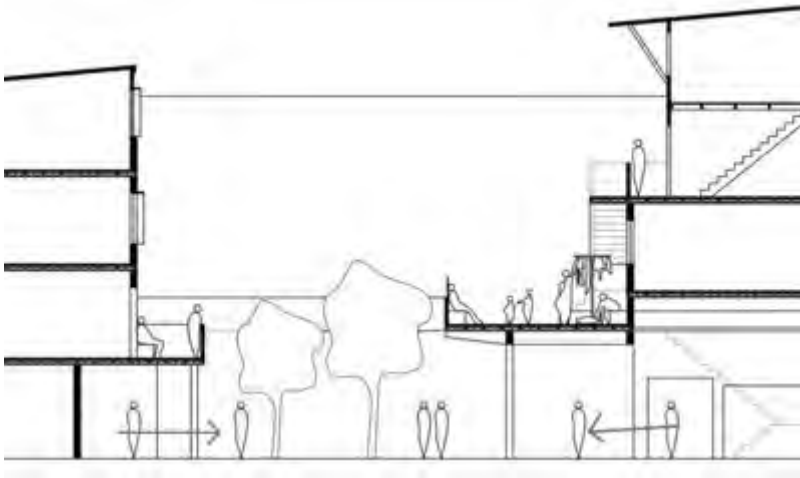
A section through the Sibanye Market Housing showing the communal elevated platform for hanging washing and children to play.
